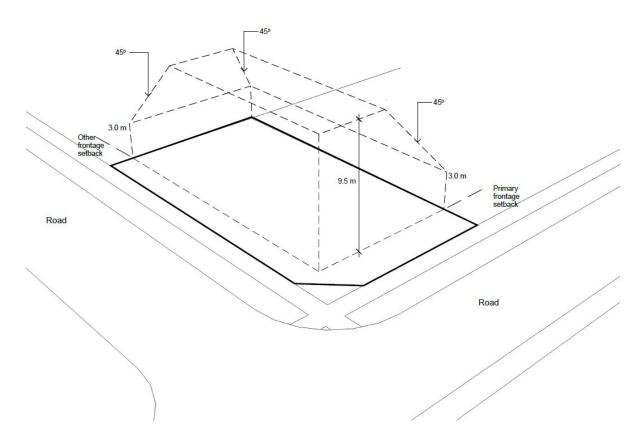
Building envelope for corner lots as required by clause 9.4.2 A3(a) and clause 9.5.1 A2(a)
